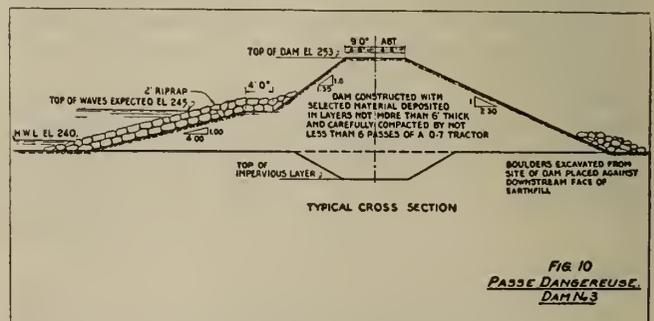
Typical cross section of Dam No. 3 at Passe Dangereuse.
